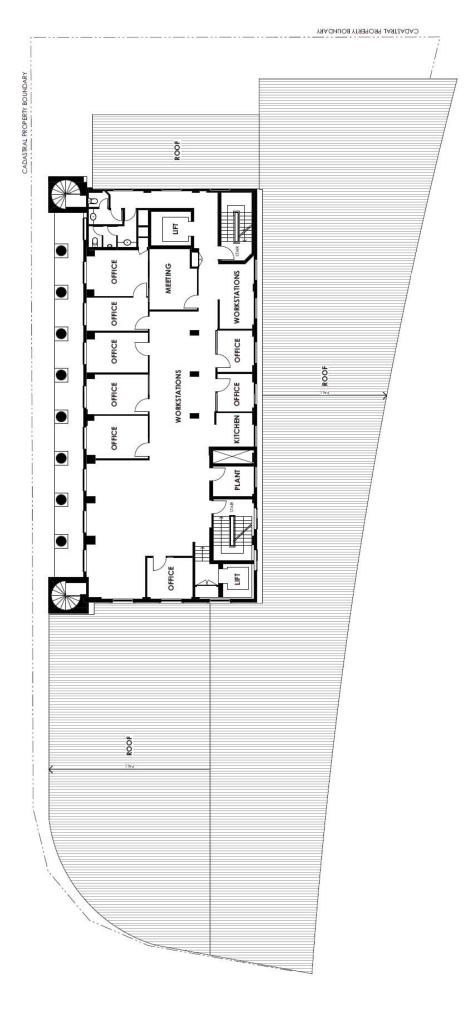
Floor Plan, Level 5 Source: ML Design 2016
